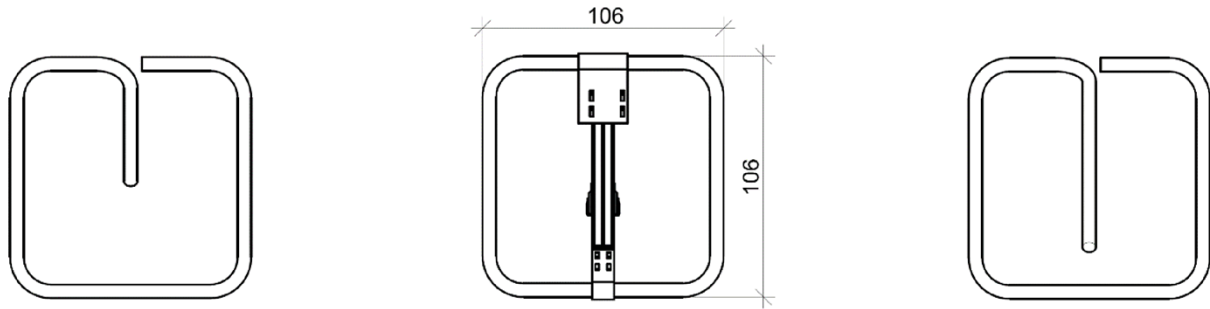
Schöck Isokorb® Type K with CCE with integrated reinforcement stirrups as per section D.1.1 and special stirrup
